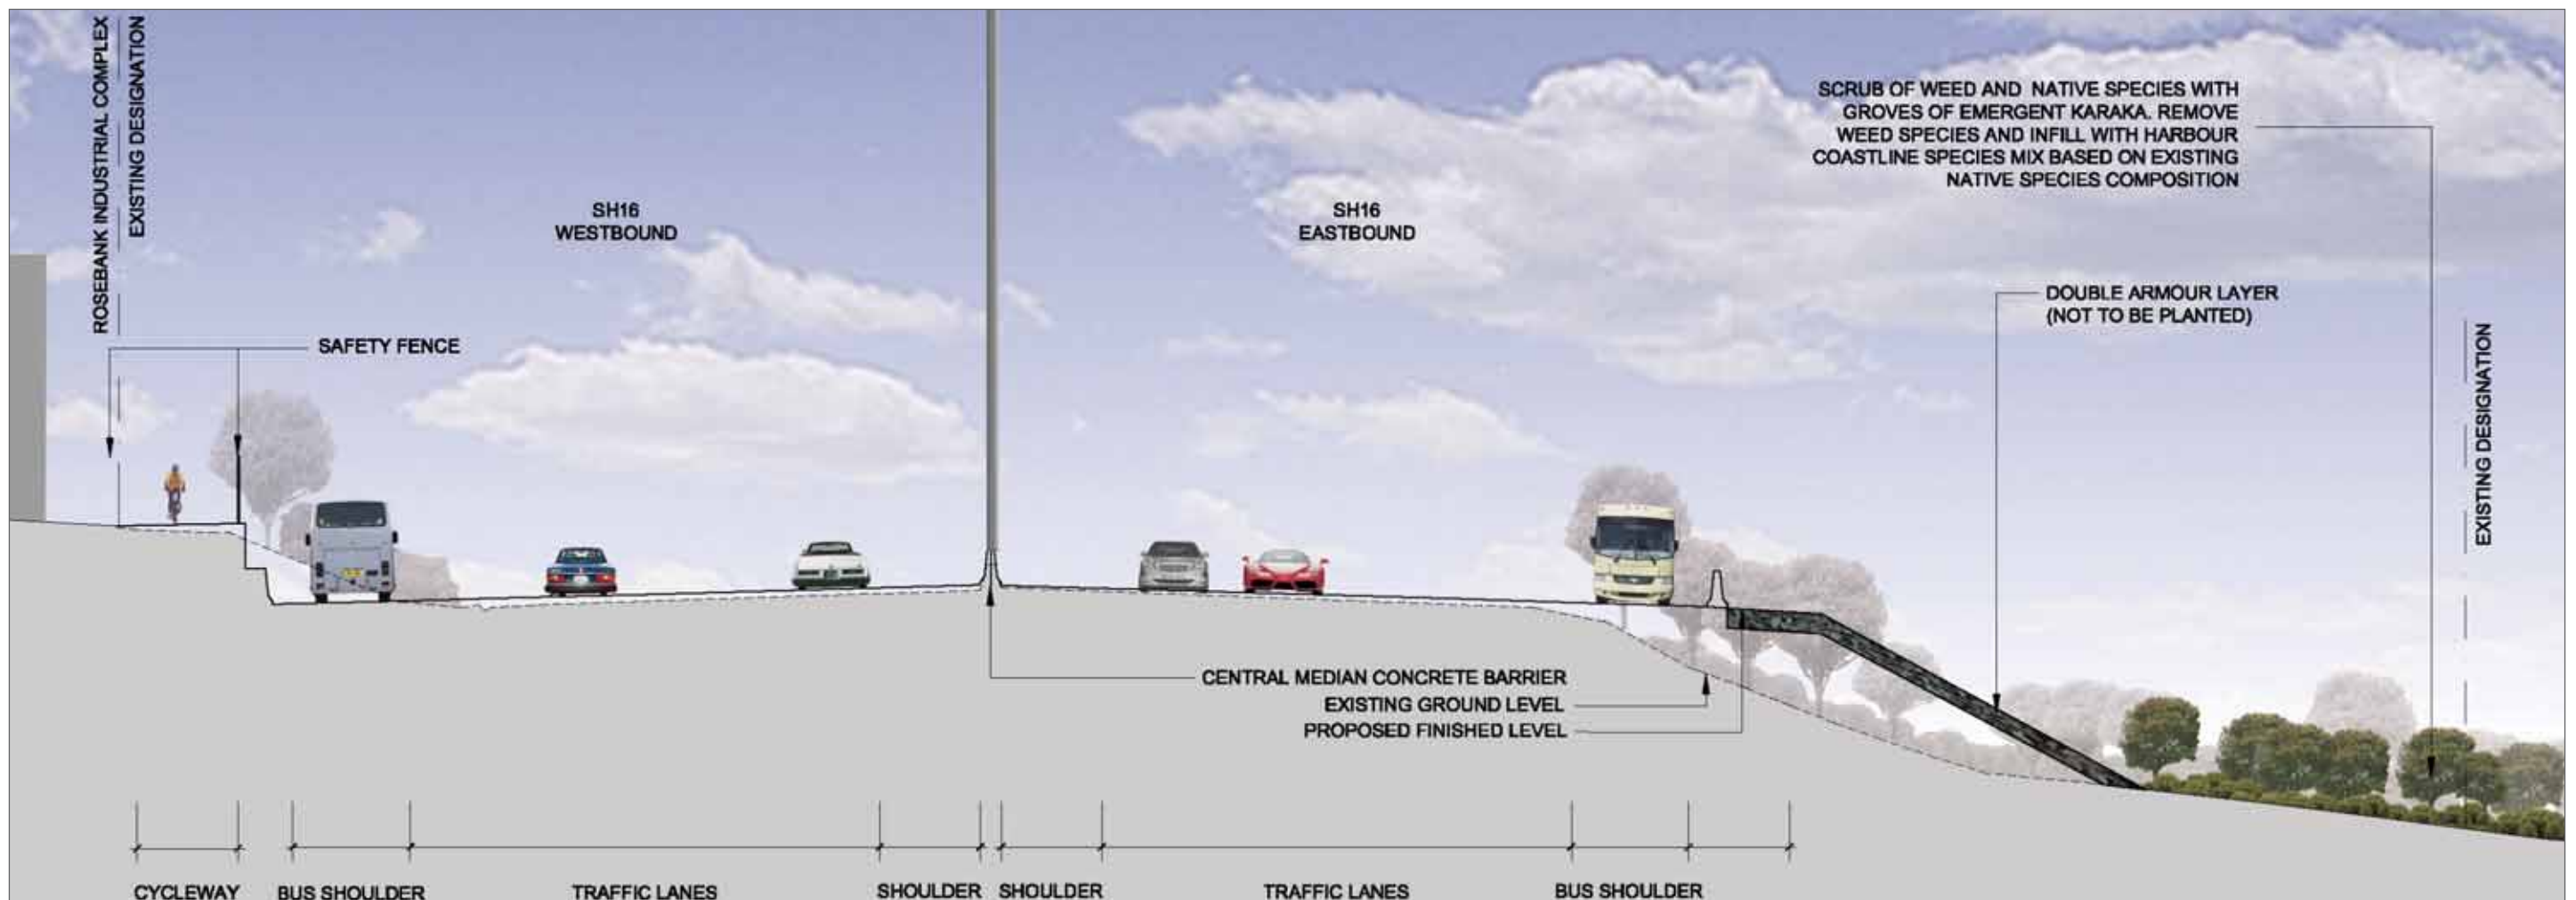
Future cross-section immediately west of Rosebank Road compared with existing arrangement (section B)
